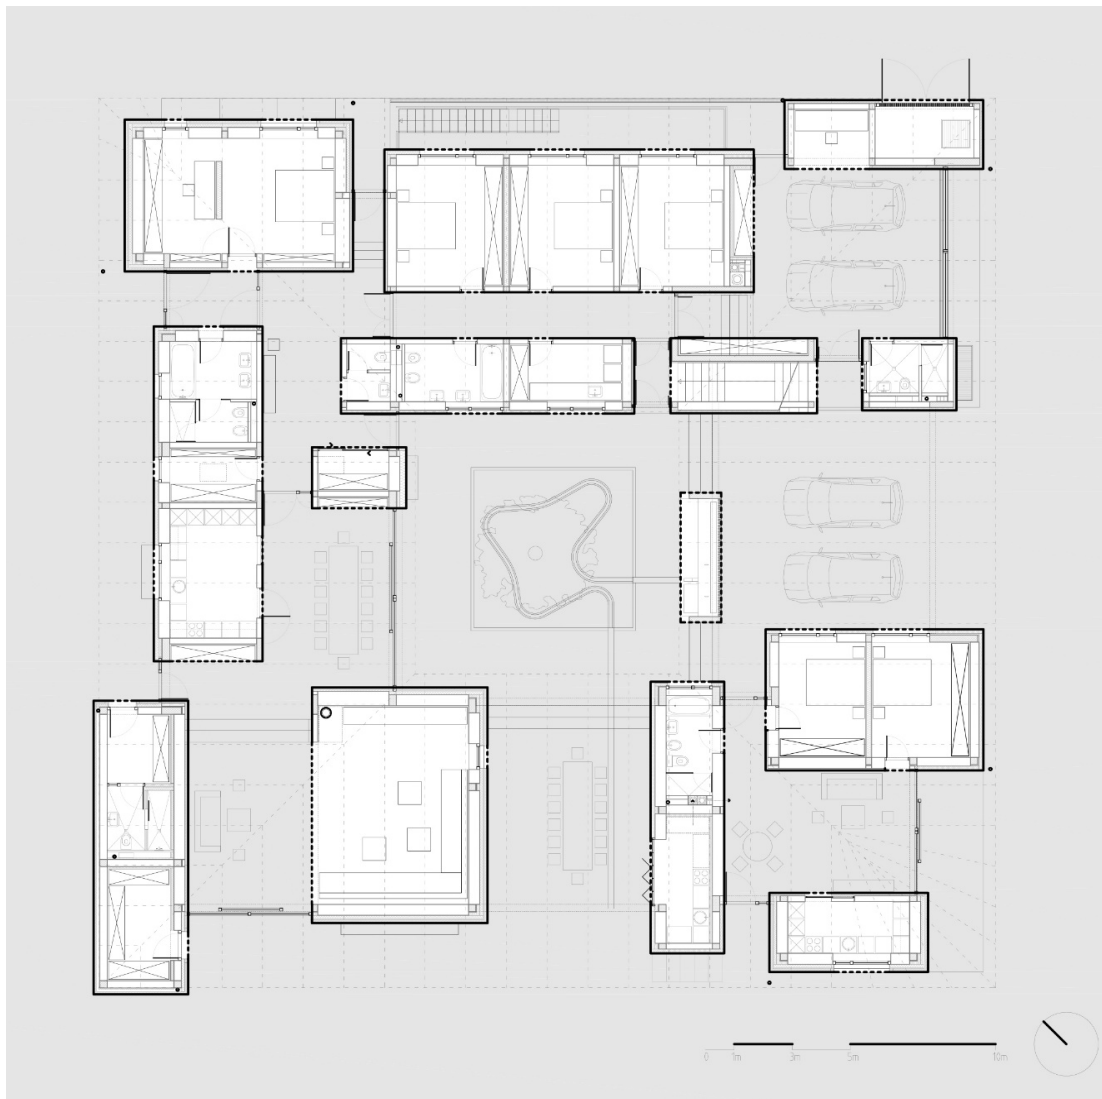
House VLHS, ground floor plan © Vedad Islambegović.
